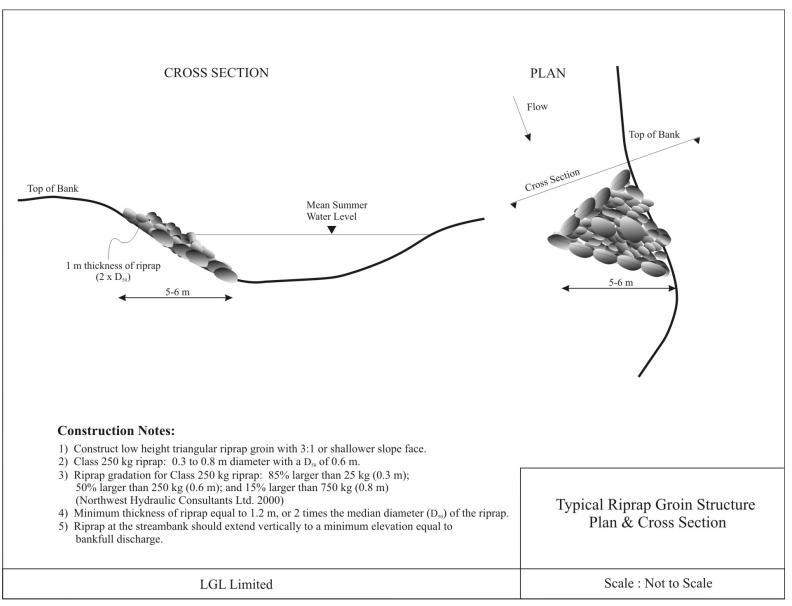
Typical plan and cross-section views of a riprap groin structure.
